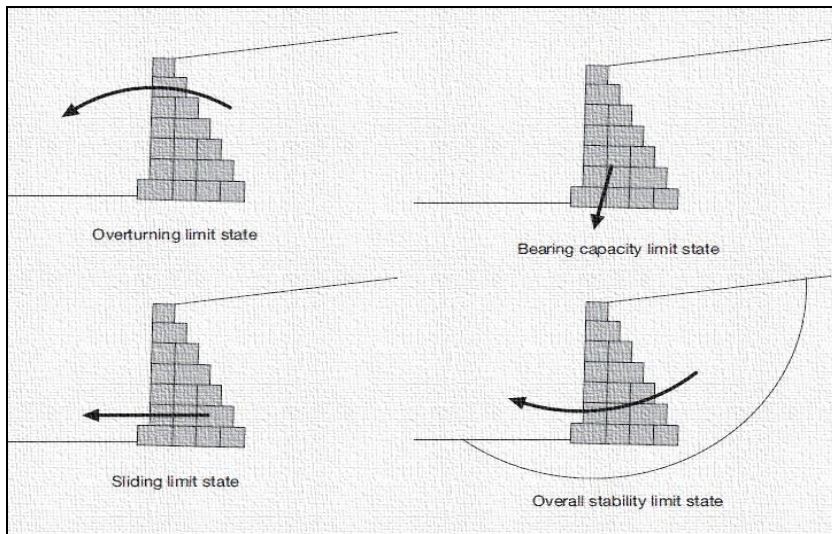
Possible schemes of destruction of the gabion gravity wall [available online]
